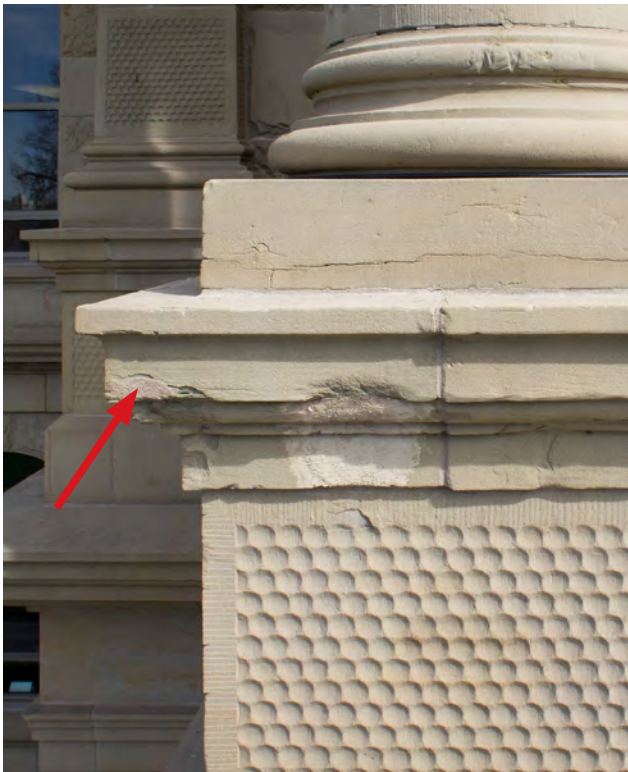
Deterioration and Failed Patch Repairs at the Column Bases.
